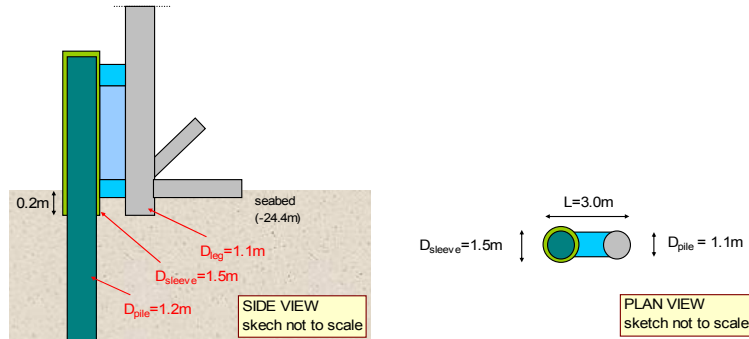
Schematisation of connection between jacket and skirt piles at the seabed (sketch not to scale): side view and plan view.
